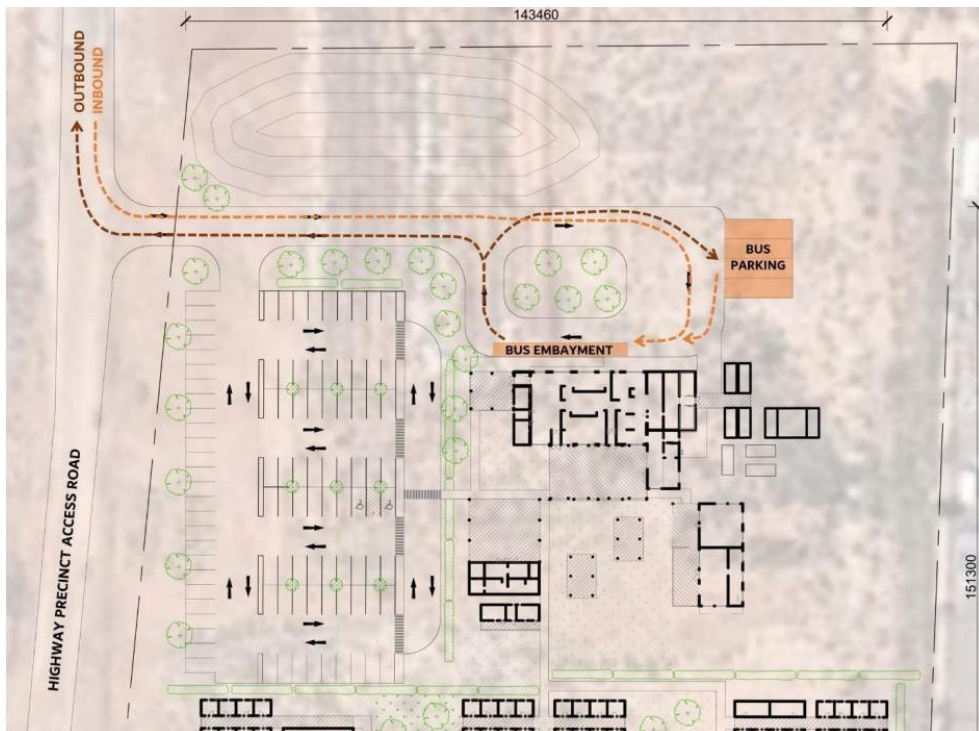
Proposed bus pick-up / drop-off and parking movements into the site (base plan source: Grounded, 2022)
